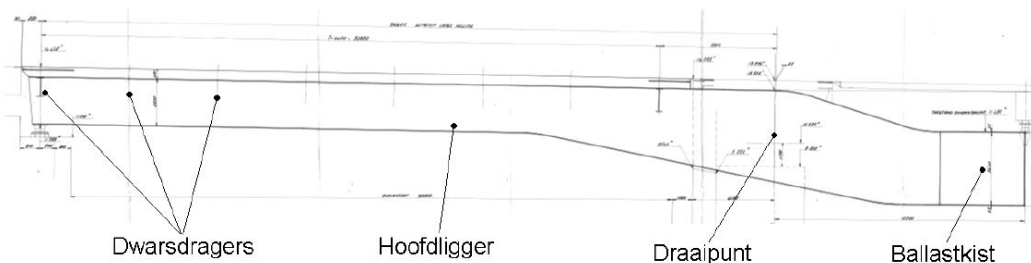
Original drawing of longitudinal cross section bascule bridge leaf Beneden Merwede Bridge
